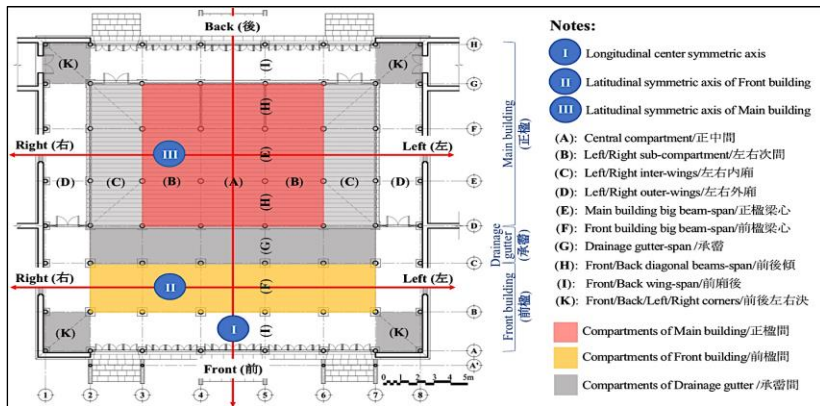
Spatial arrangement on the floor-plan of the twin buildings
